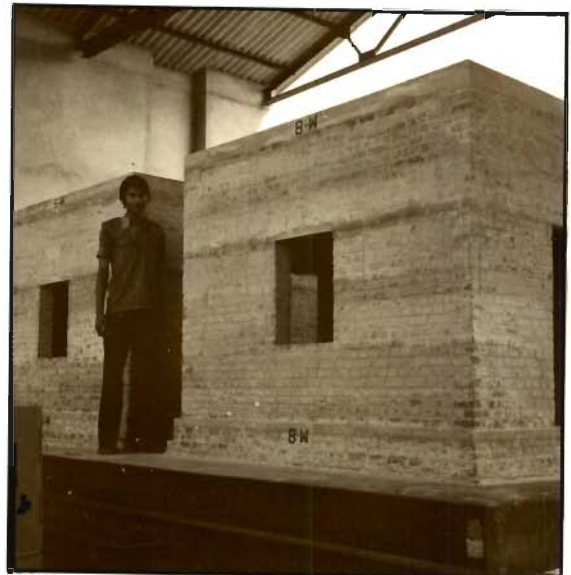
\_ MODELS 6 AND 8 (UNSTRENGTHENED AND STRENGTHENED IN CEMENT MORTAR) BEFORE SHOCK LOADS
